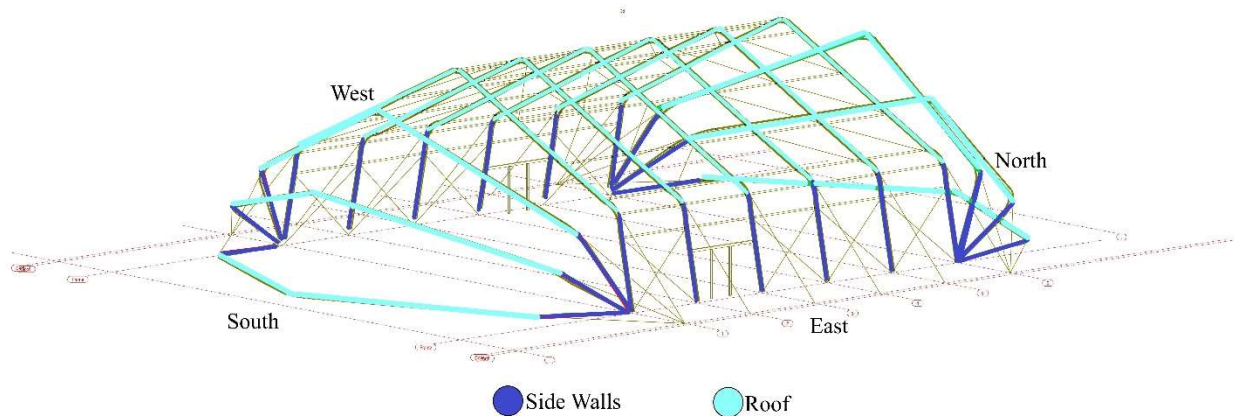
Layout of the second alternative longitudinal wind load case
